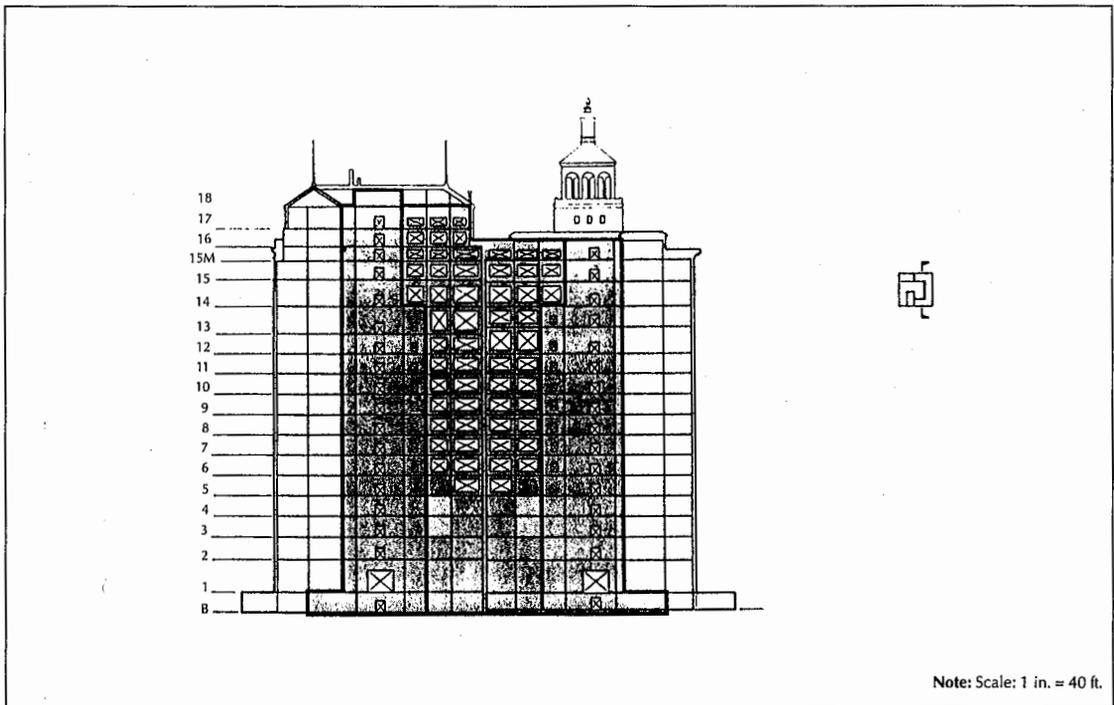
South court wall elevation of the PG&E Market Street complex.
